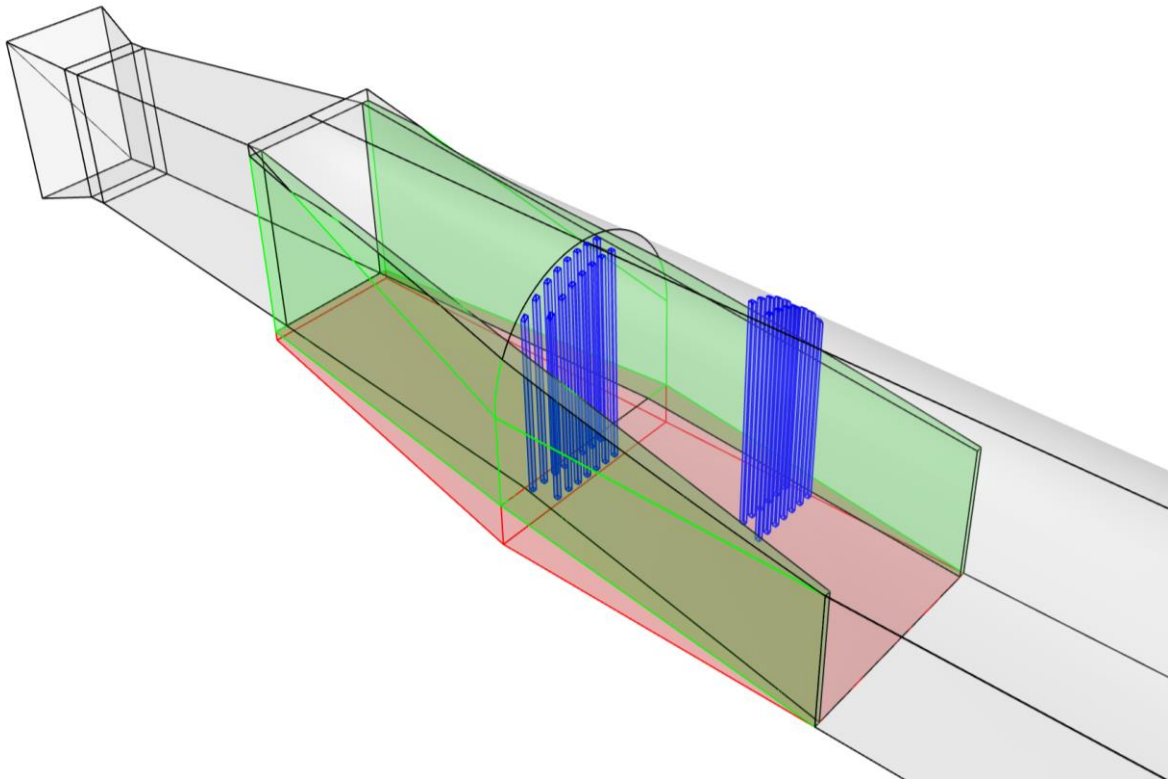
Side walls as diffuser extension in addition to bottom ramp plus double row squared calming piles with 20/20 cm distance 40 cm, 3D view
